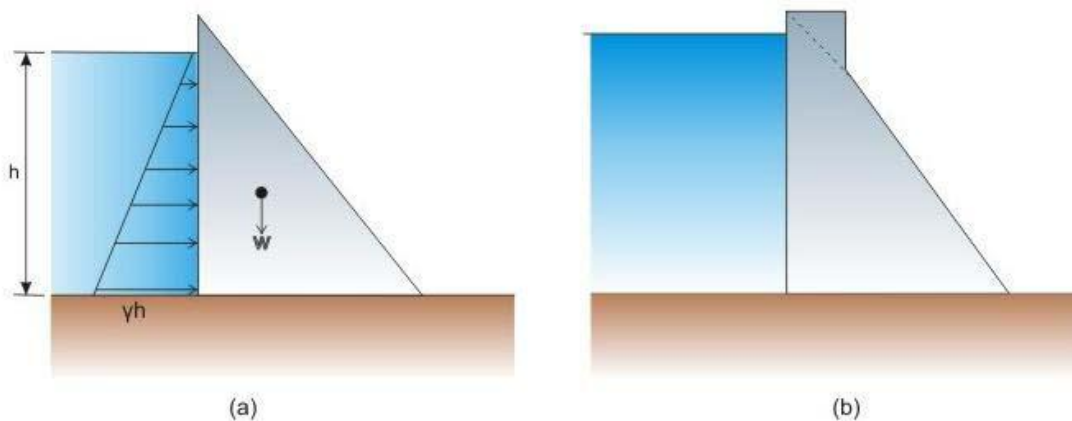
Concrete gravity dam section (a) Basic triangular shape (b) Modified shape
